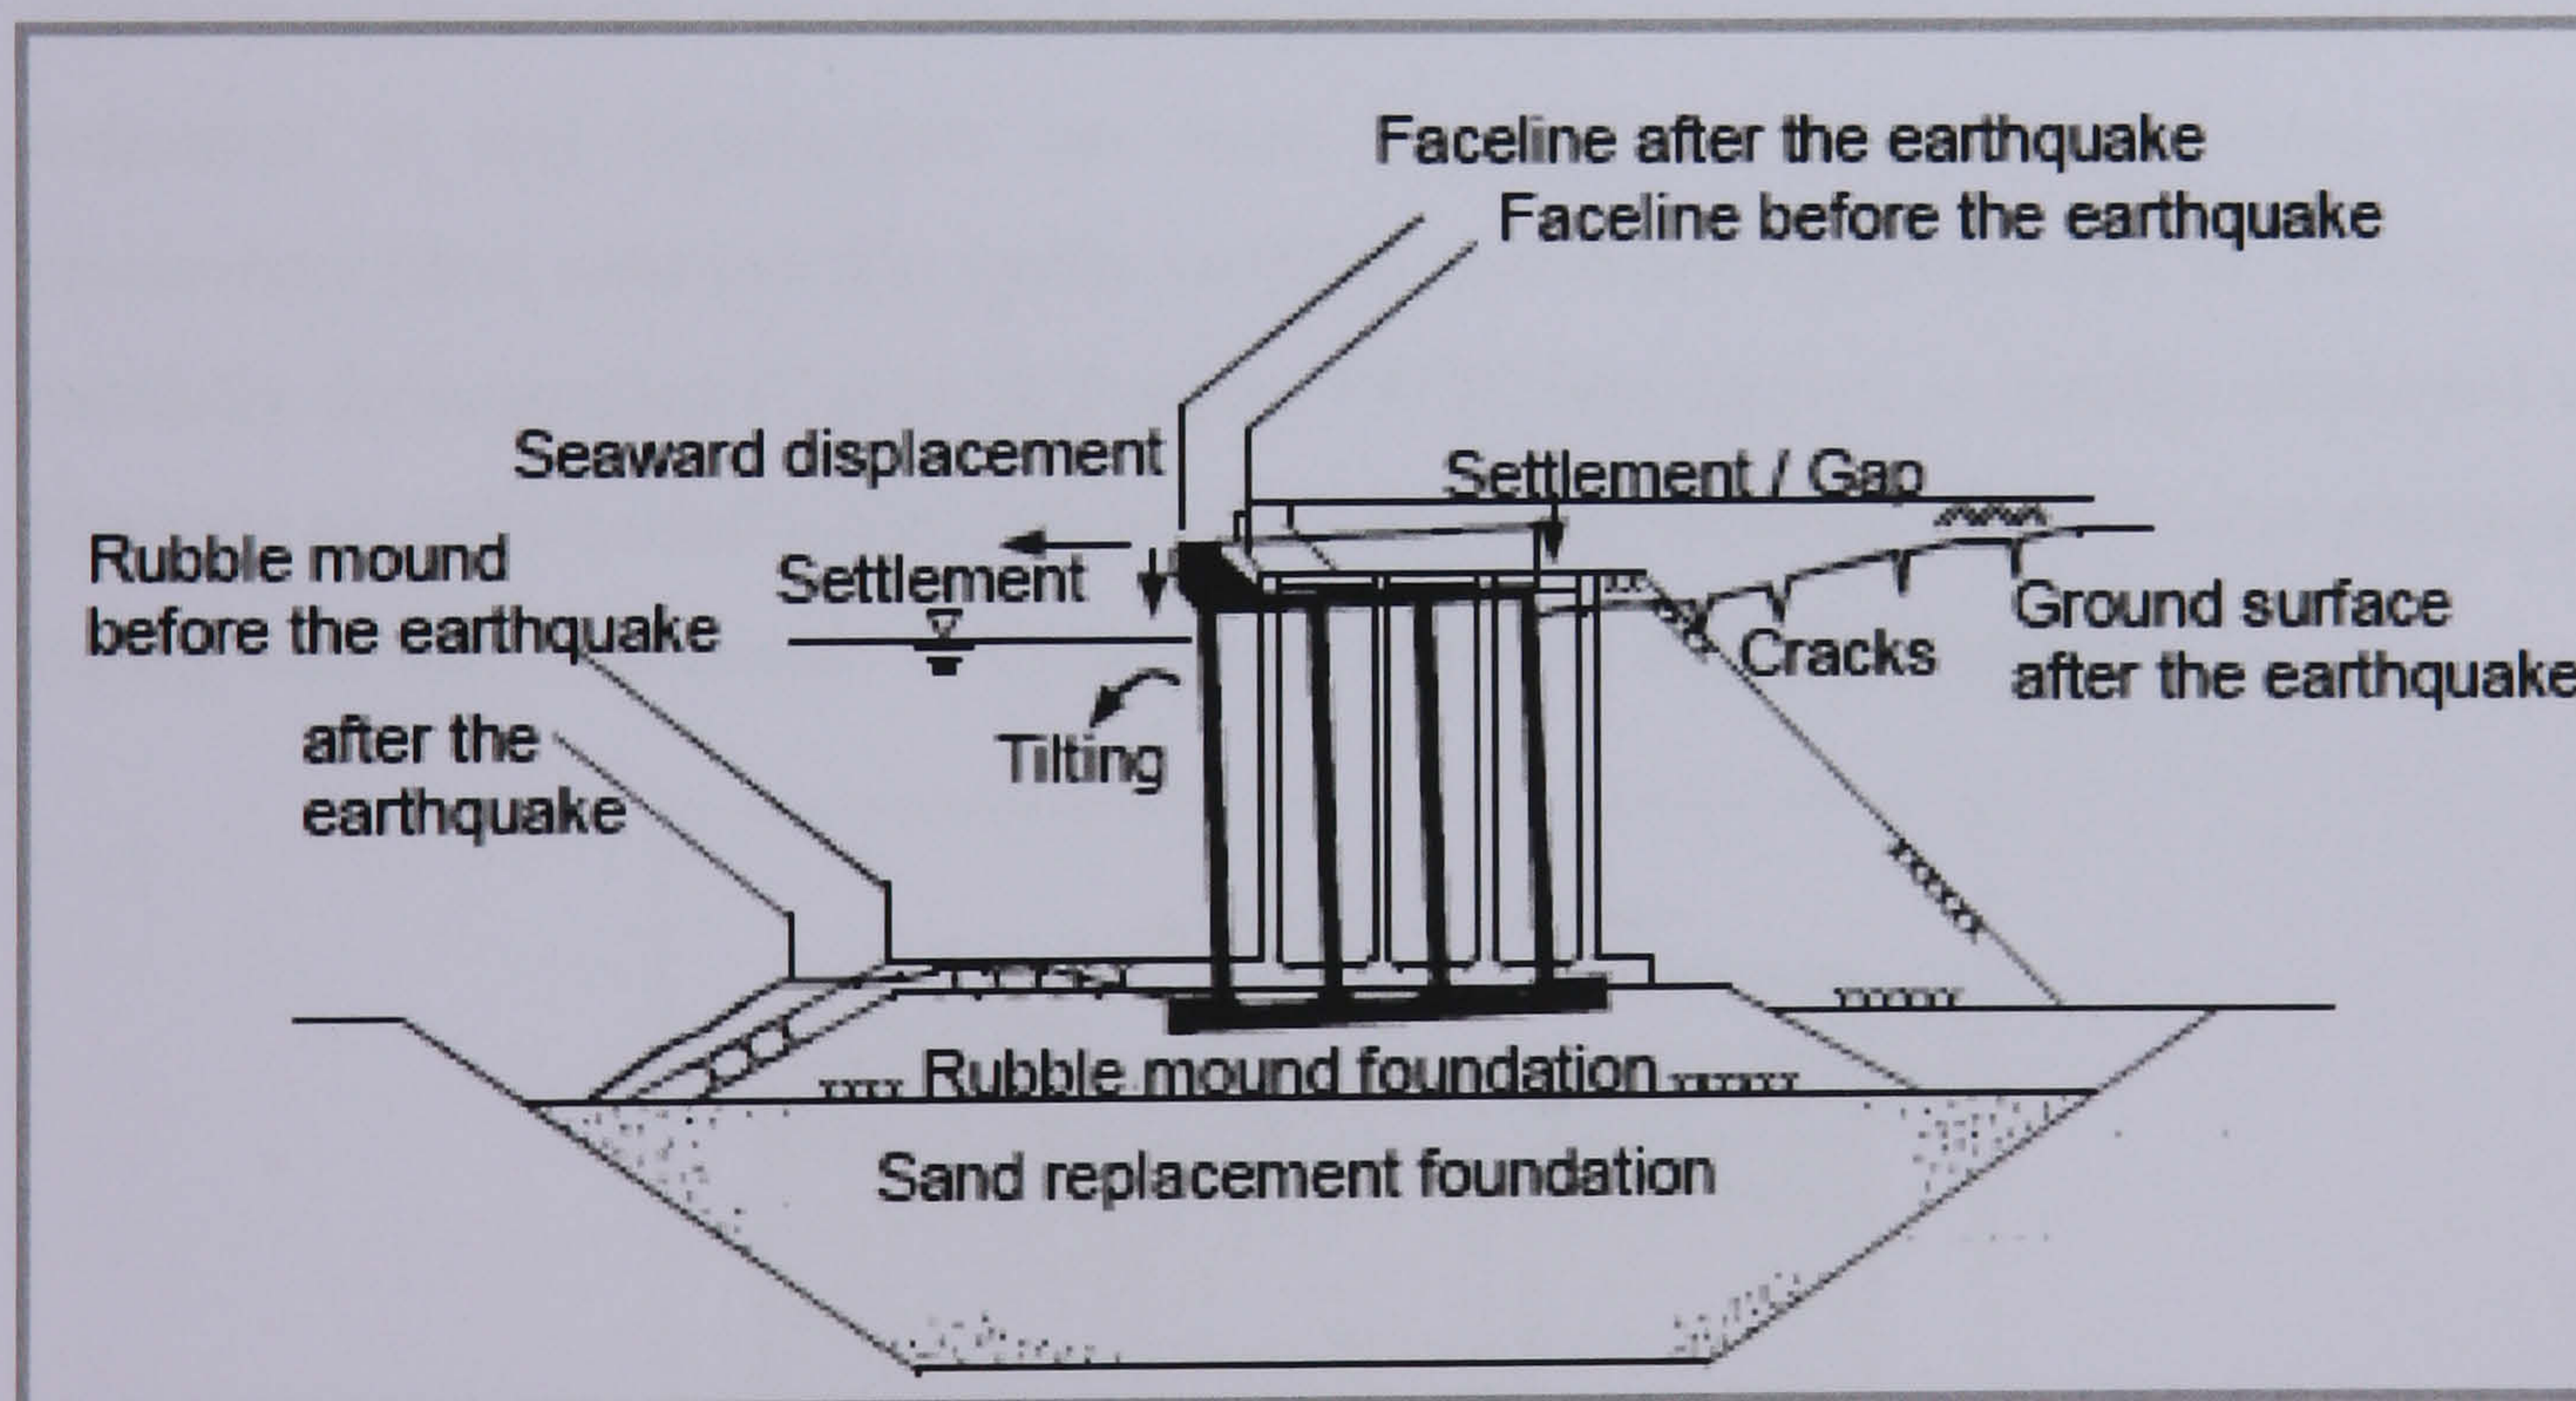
A typical failure mode of a caisson-type quay wall due to earthquake, after Ichii (2004)
